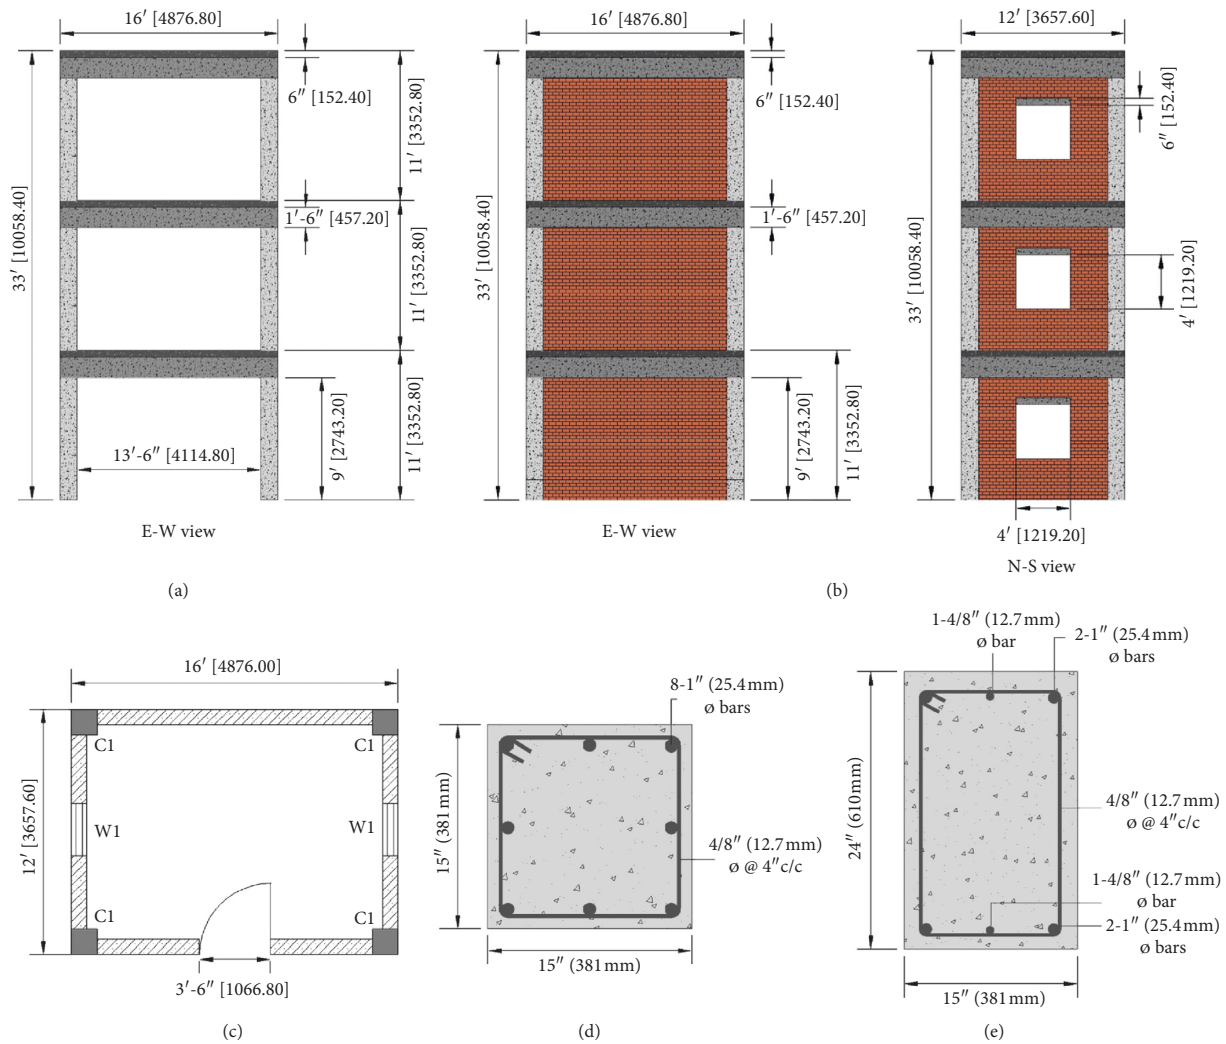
Geometric and reinforcement details of the prototype frames. The dimensions in brackets are given in mm. (a) RC bare frame (b) Masonry-infilled RC frame. (c) Plane view. (d) Column X-section. (e) Beam X-section.
